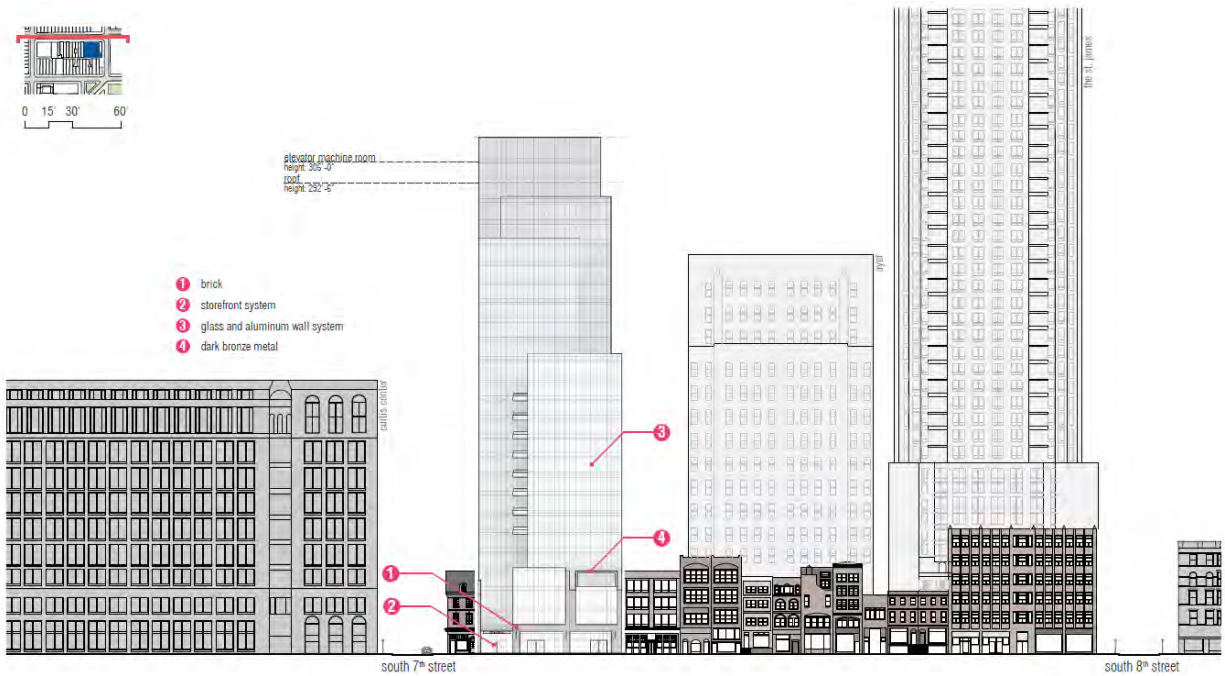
The north or Sansom Street elevation of the proposed tower for 708 Sansom Street with context reviewed by the Architectural Committee and Historical Commission in January and February 2020.
